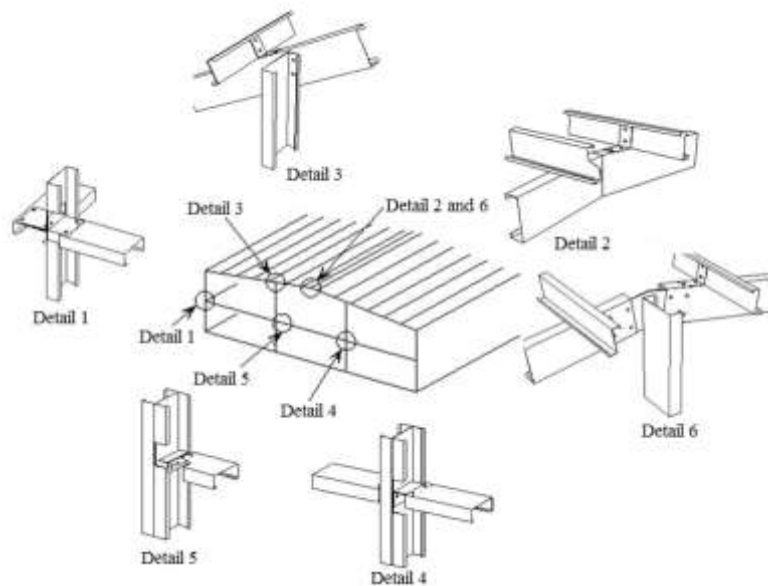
Cold-formed steel sections used as column, rafters, and purlin (ECCS, 1987)
